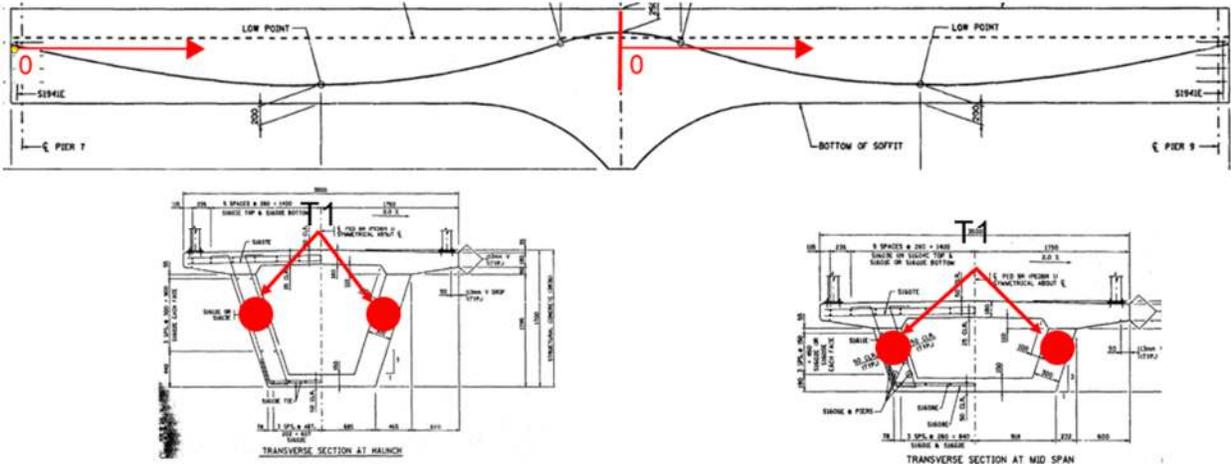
Elevation and Cross-Section View of the Girder for Vehicular Bridges in Minnesota
